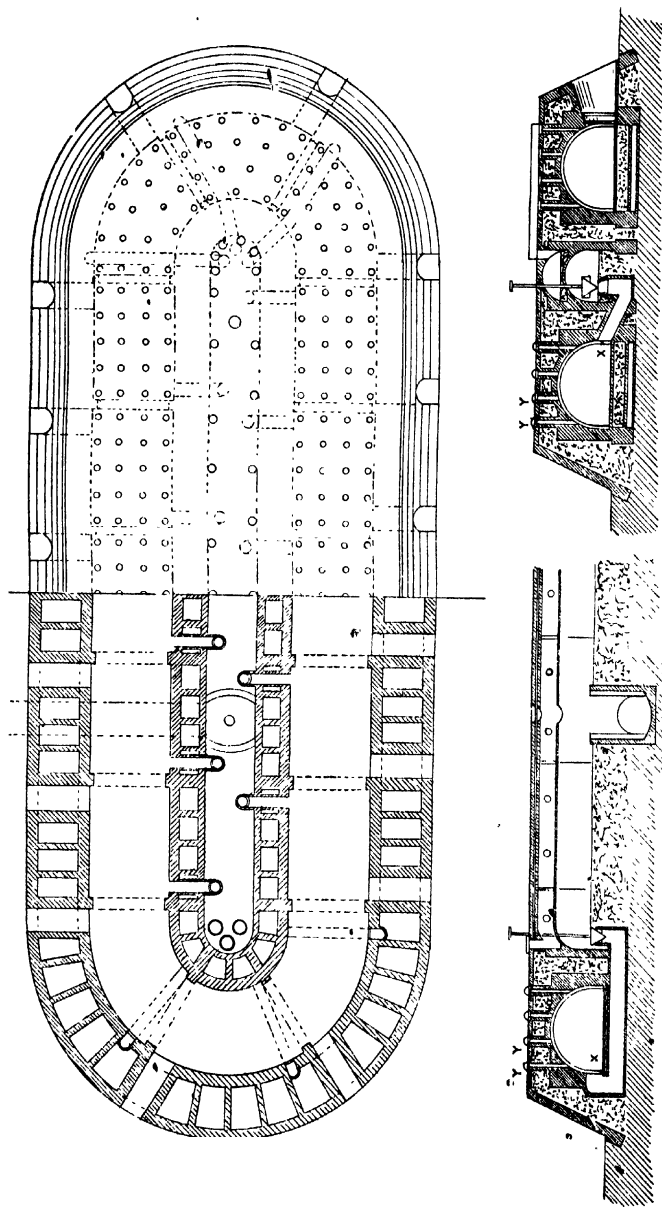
The Hoffmann Kiln.—Plan and Sections.
